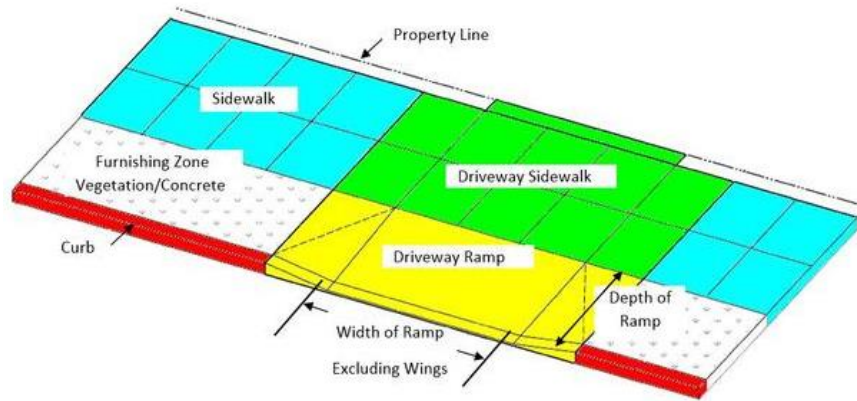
The way pedestrian sidewalk should be paved on one level and the driveway is ramped across it. Used on drive-ins intersection with a pedestrian walks
